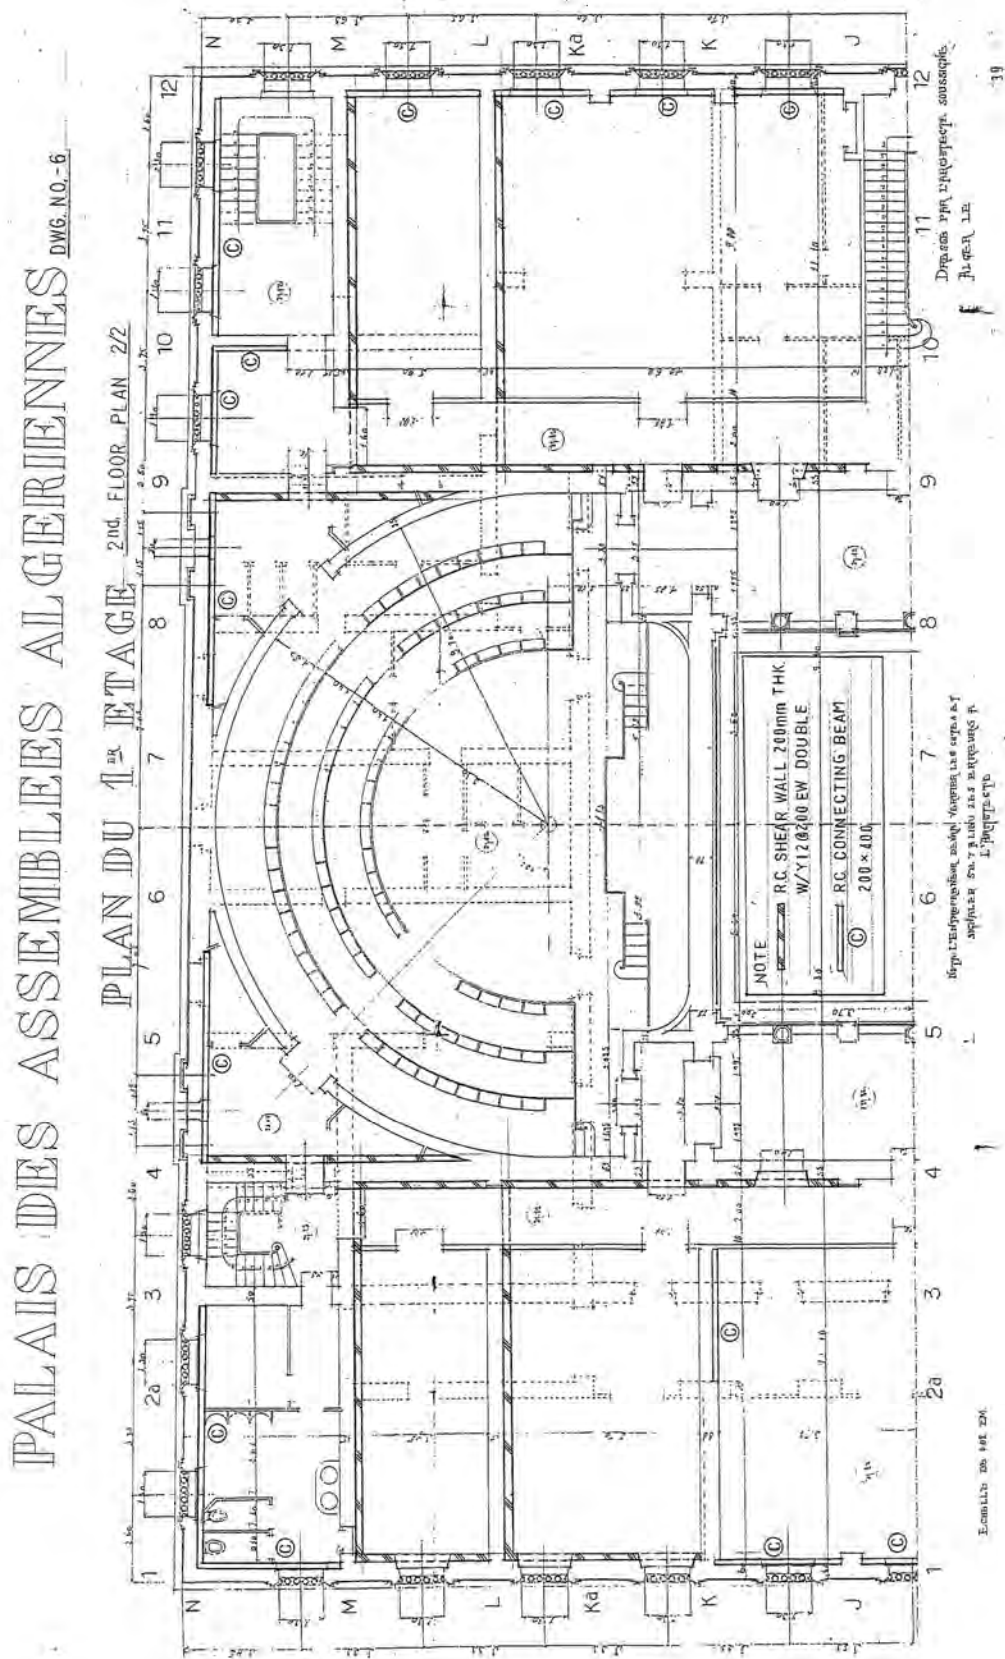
Retrofit Plan on 2nd Floor (2/2)
